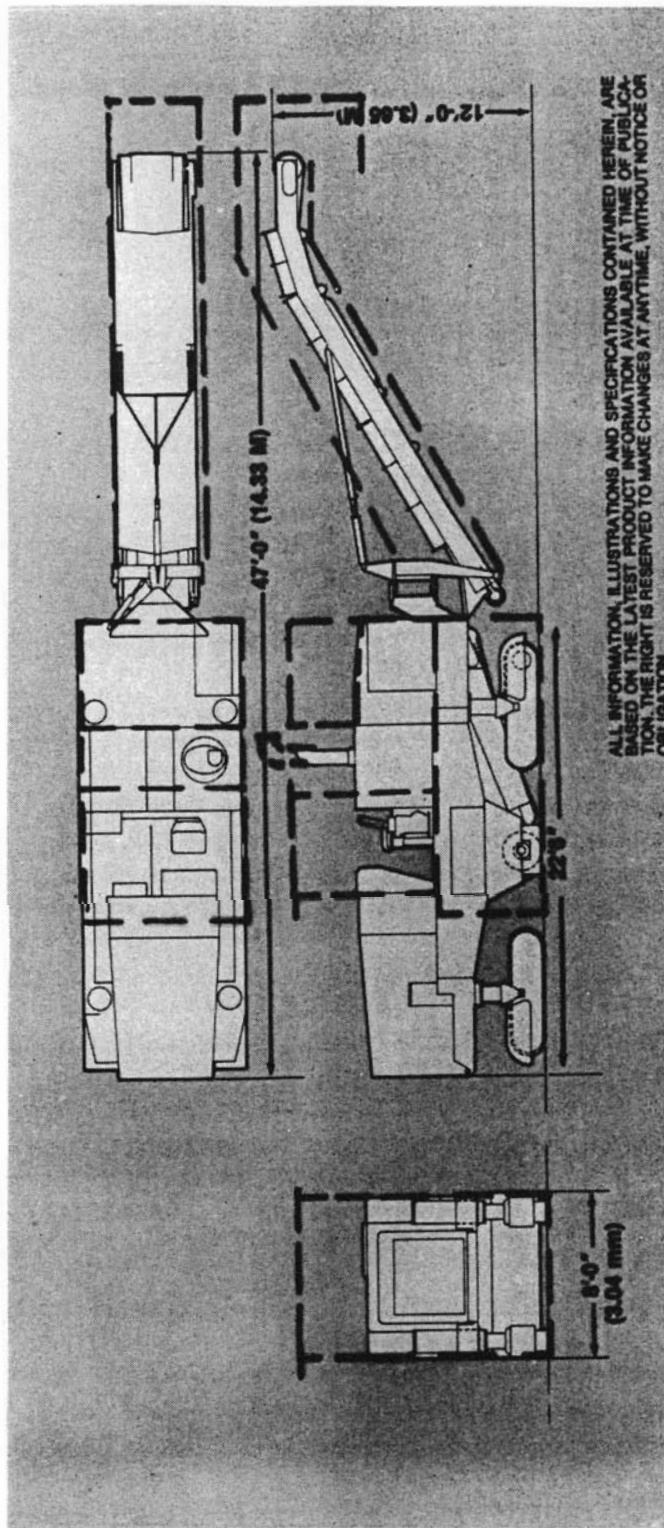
Schematic View of CMI PR 525 Pavement Profiler
